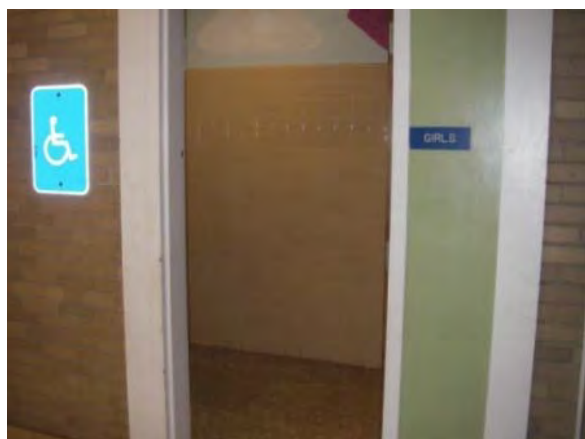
1952 WING RESTROOM ENTRANCE
